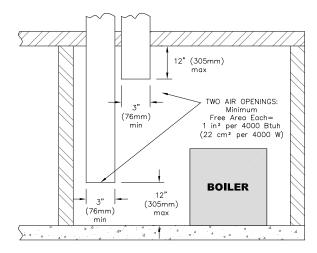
Air Openings – All Air from Outdoors through Vertical Ducts
